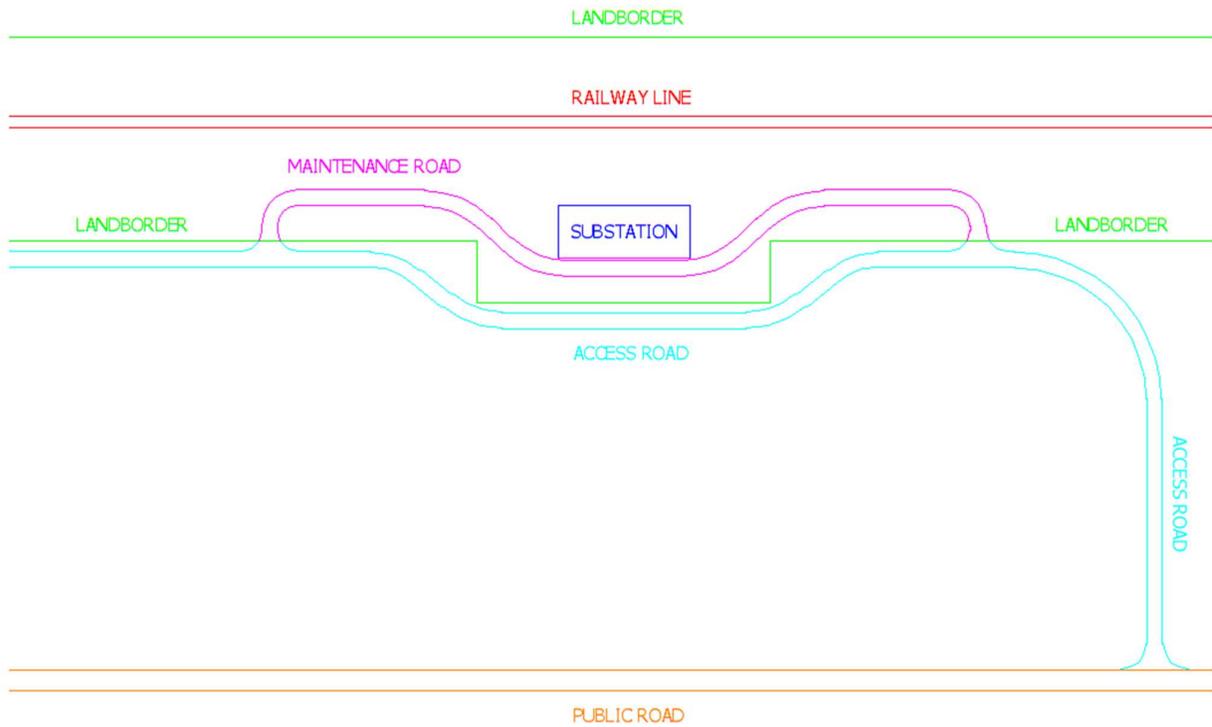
RECOMMENDED PRINCIPAL ROAD SCHEME FOR SUB-STATION
